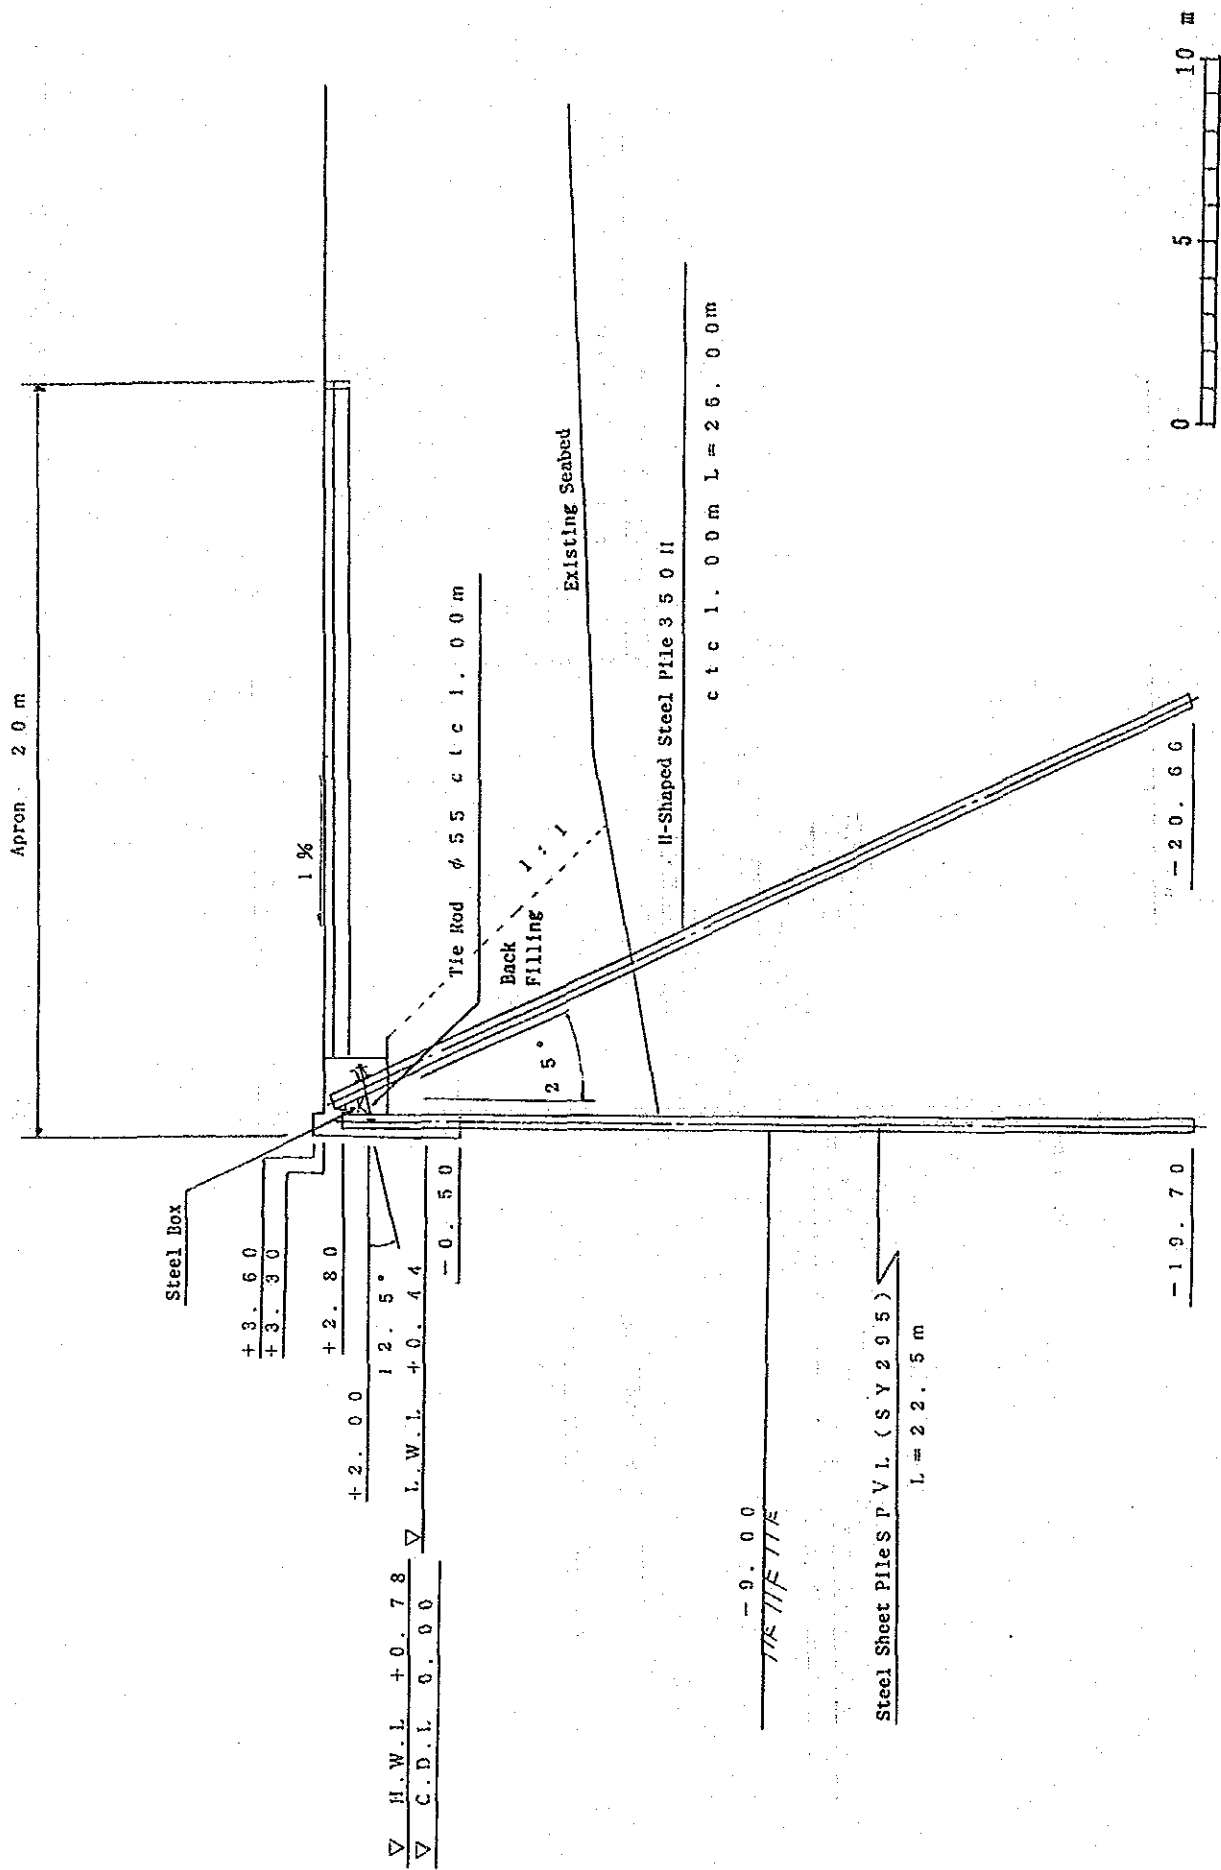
Typical Cross-section of Extension of Dock-B
